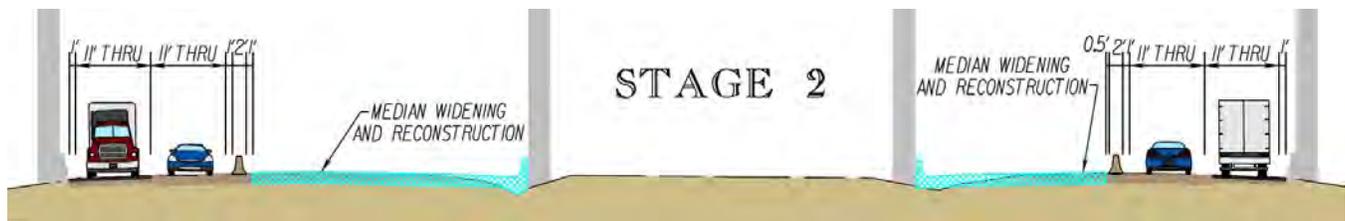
Stage 2 Traffic Condition Under Bridge at Exit 205
